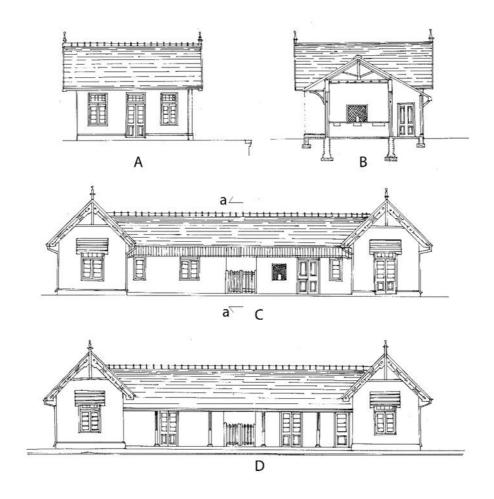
, Ella railway station, A; side view, B; sectional view, C; road side view, D; Platform side view (source: Redrawn, survey department, plan no 06997, SLR)
